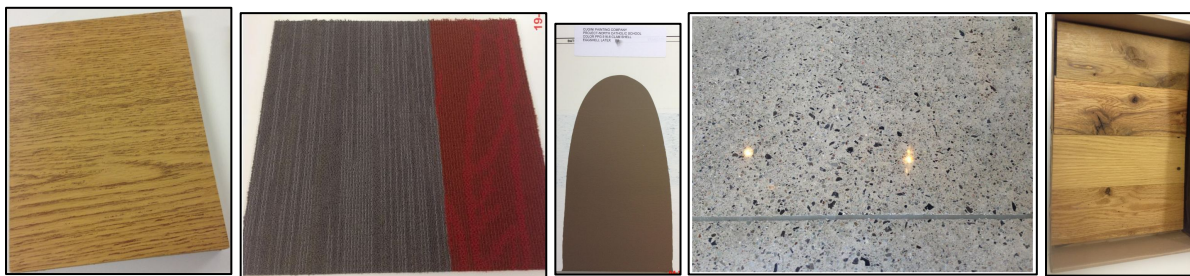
Installed Finish Materials (Property of Mascaro Construction)
